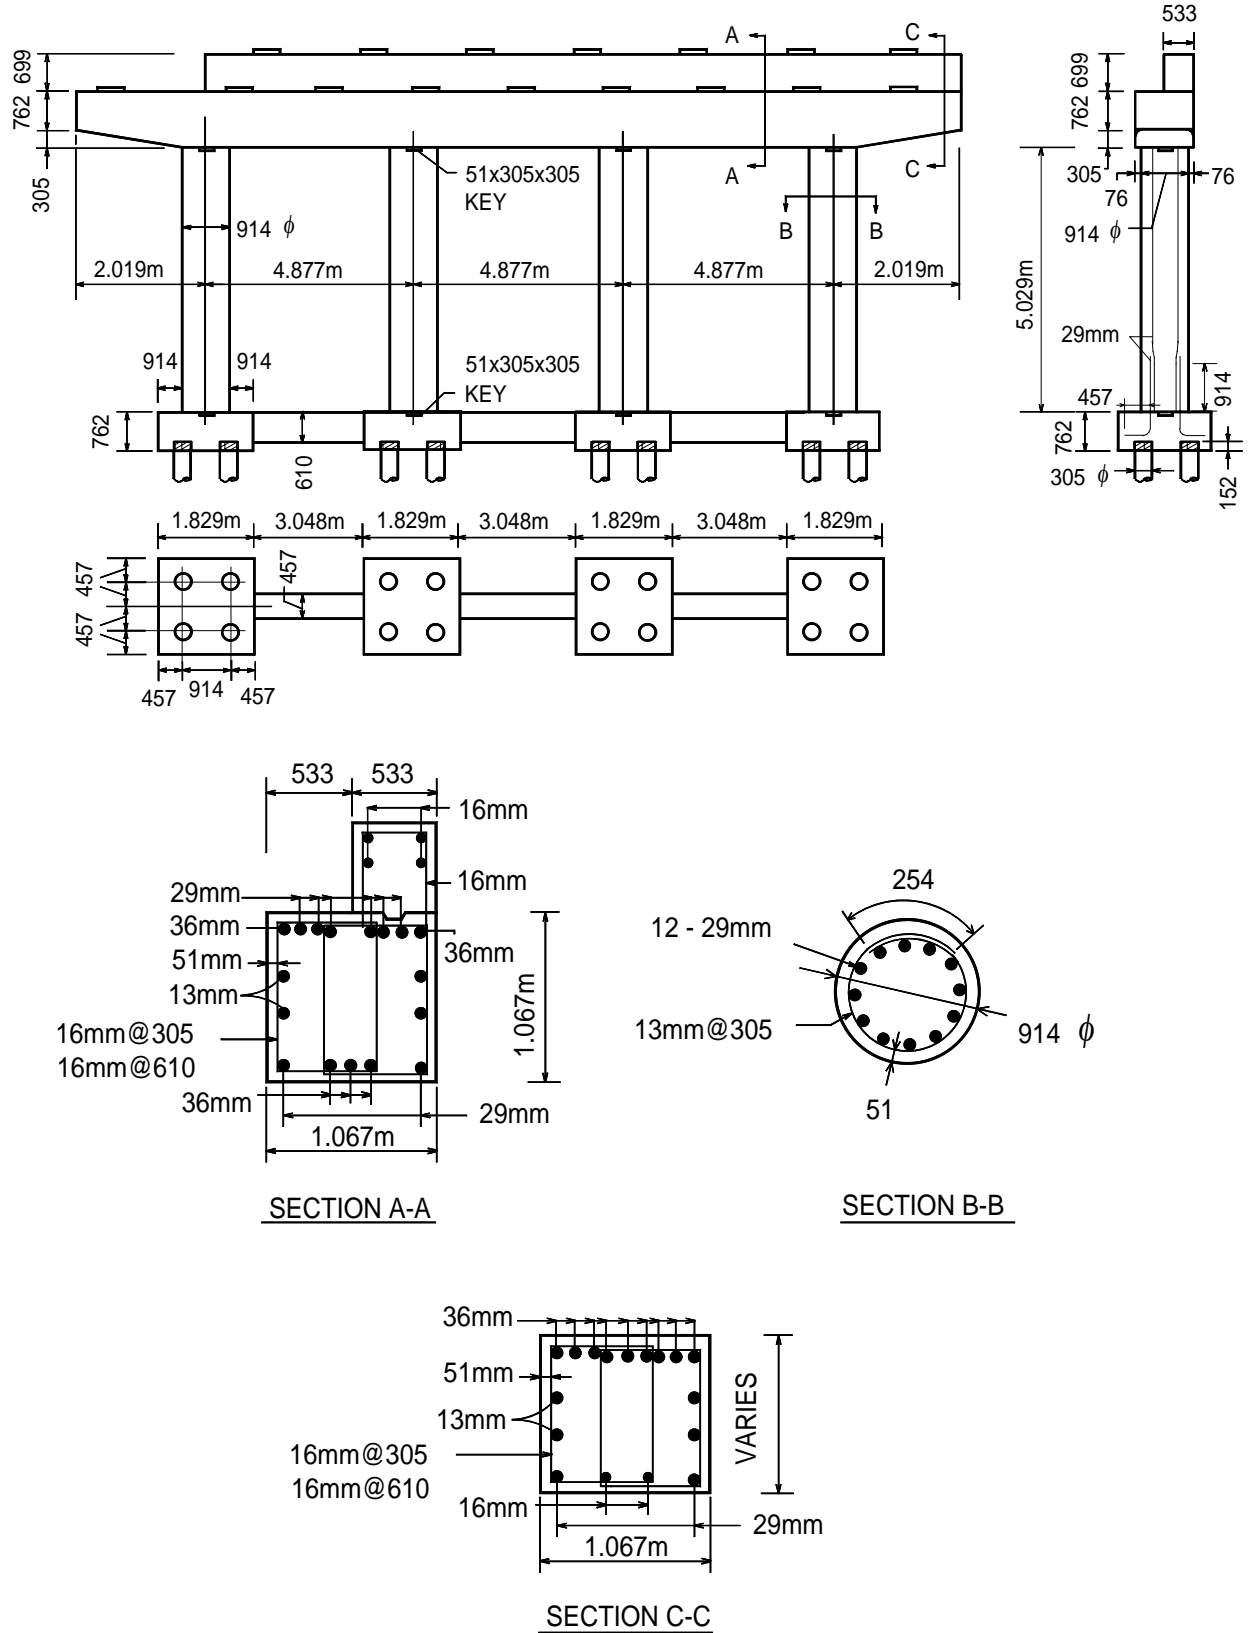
Dimensions and Reinforcement of Typical Bent of State Street
